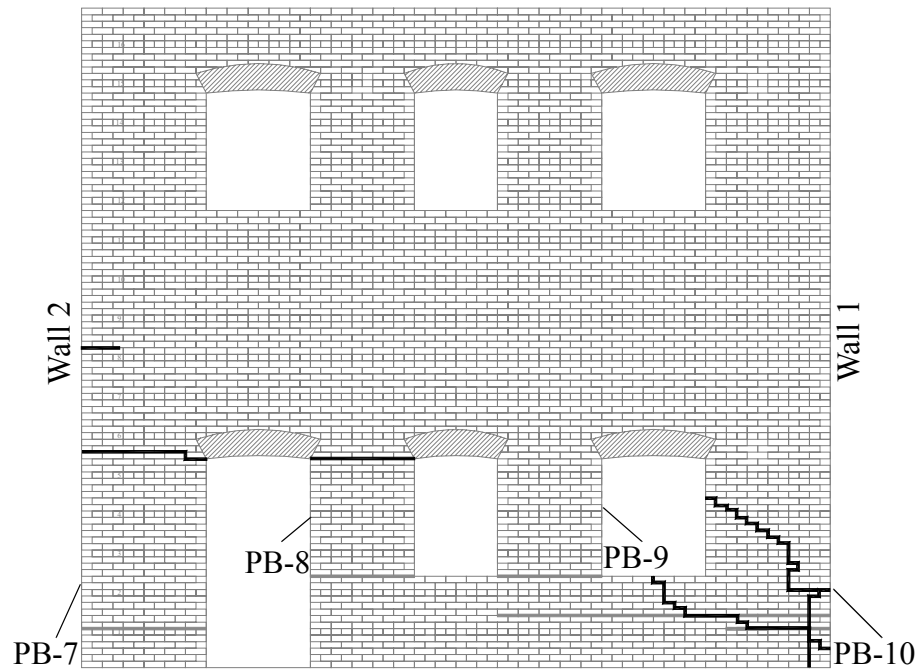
Crack pattern in Wall B following Test Run 19.
